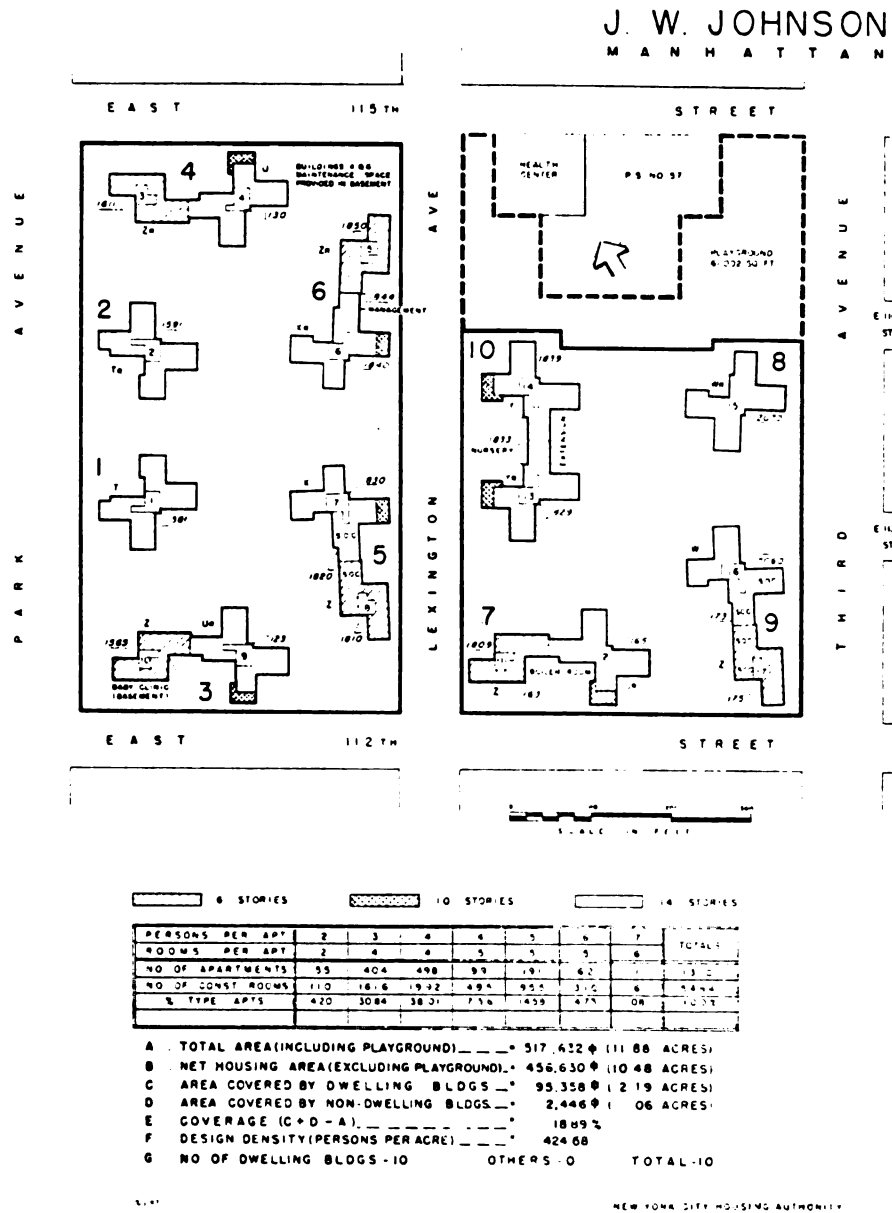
James Weldon Johnson Houses, floor plans,
